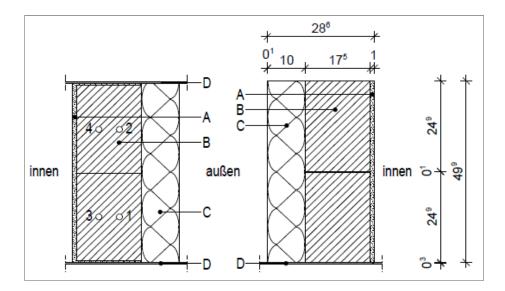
Composite wall construction; single shell wall of light (aerated) concrete blocks with thermal insulation composite system.
